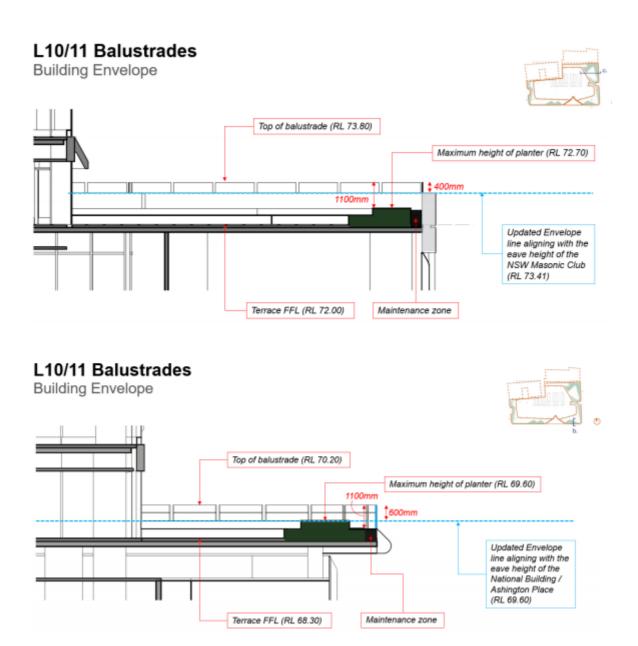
| Balustrade projections beyond proposed building envelope (blue dotted line) (Source: EIS)
